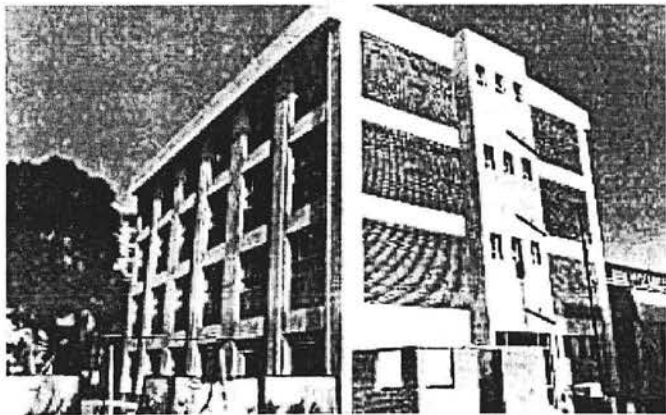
Exterior view of an eleven classrooms school 'Model 28' (GAEB, 1995).
